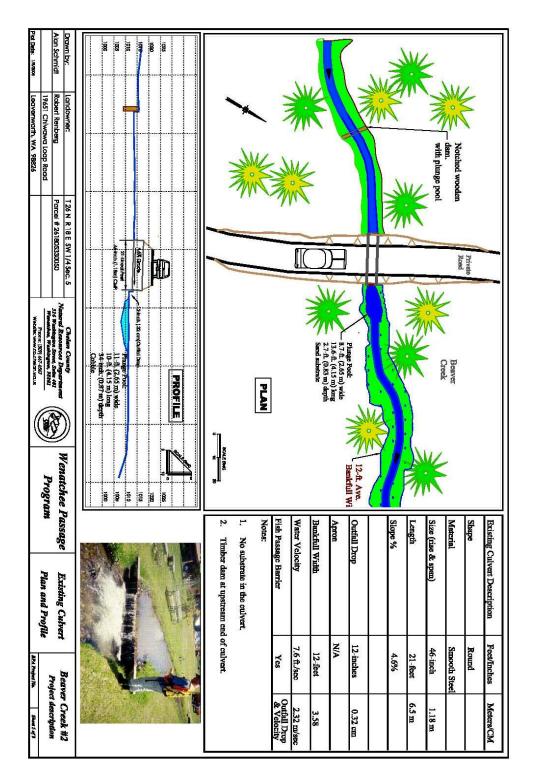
Beaver Creek Barrier #2 Plan and Profile (Photo in plan is of small dam only see Figure 6 for culvert)
